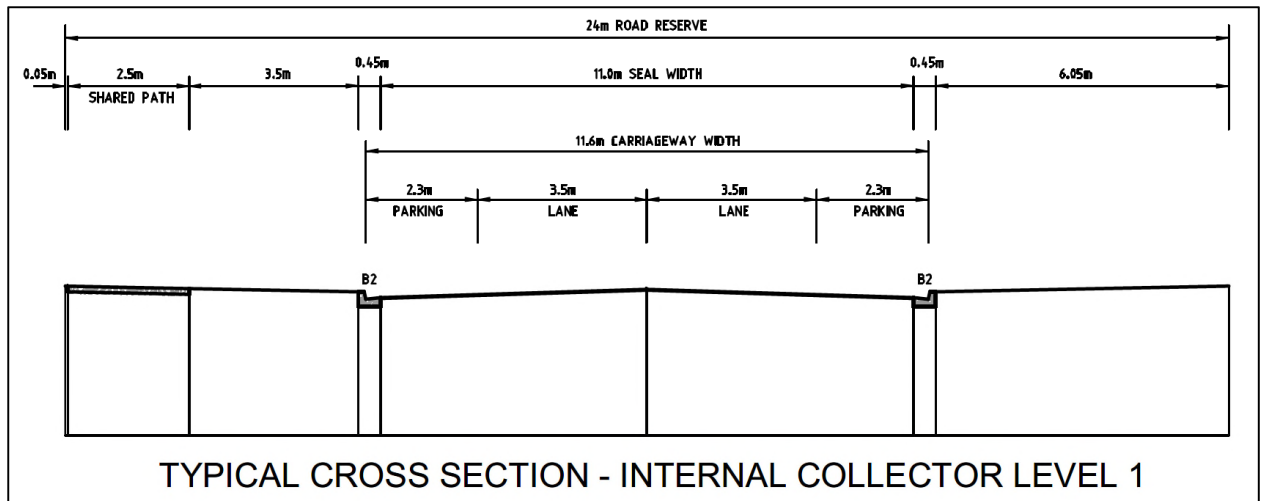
Detail, Typical Cross Sections – Road Reserve.
